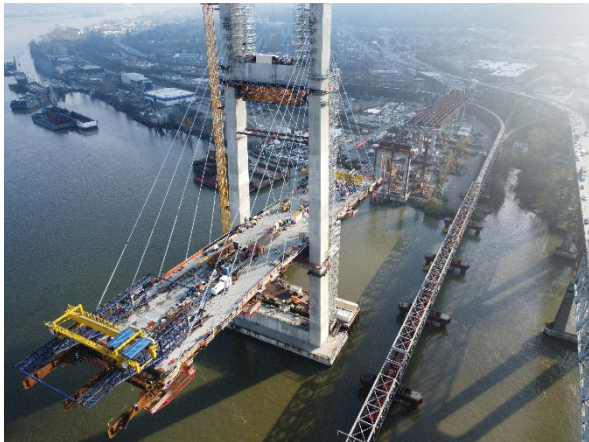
Girder erection, deck panel and stay cable installation for the main bridge continues.
